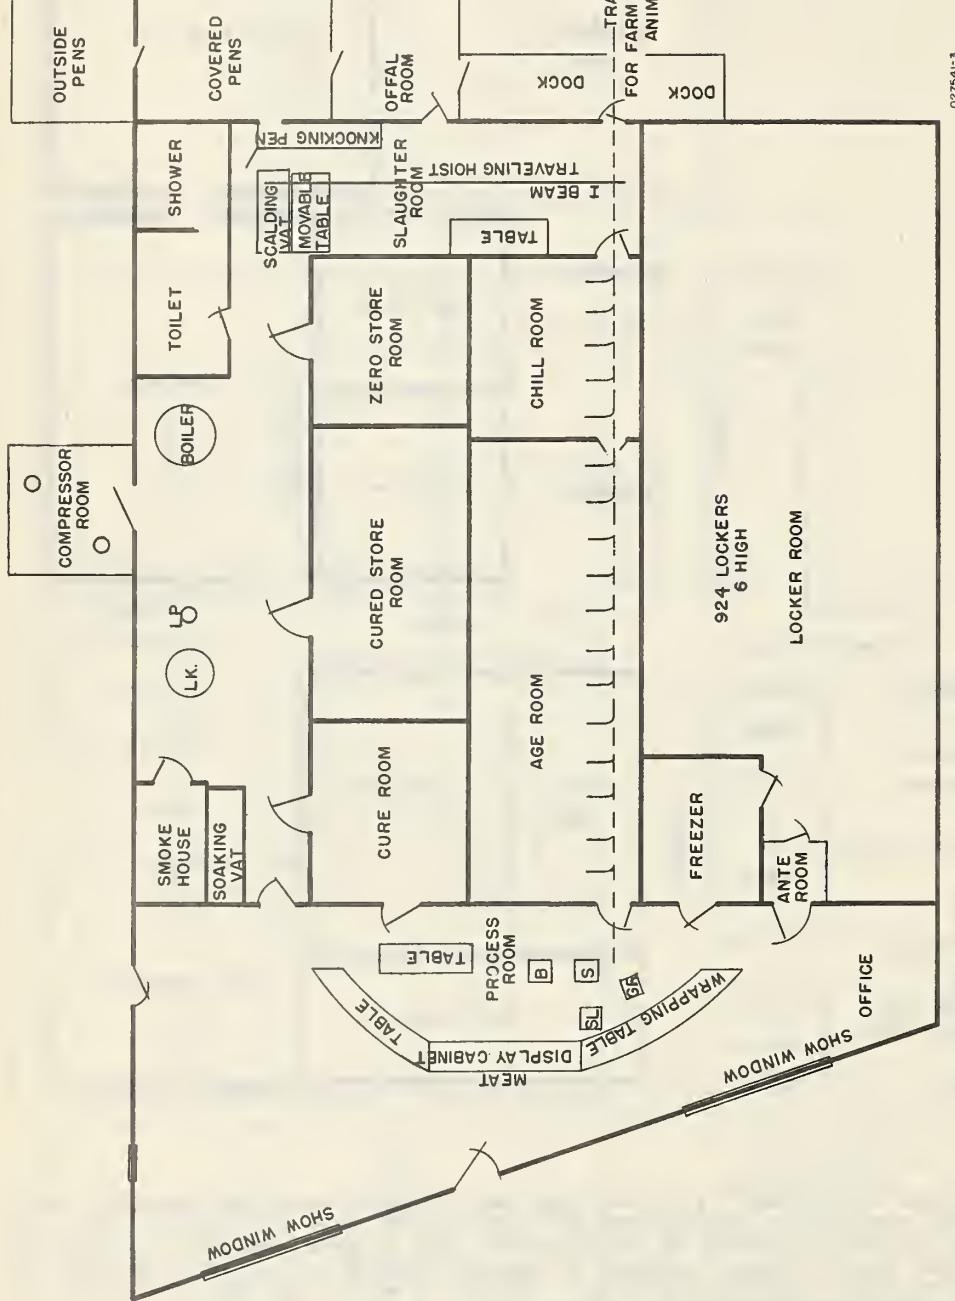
A farmers' locker and slaughter plant located in a medium size Southwestern city. The slaughter room is a small, rectangular room using mostly hand equipment with a traveling hoist mounted on an I-beam extending the length of the room. It slaughters for 924 lockers, its own retail meat market, and several outlets in the city. Its outstanding feature is a retail market selling meats and groceries. Both water and sewage disposal are supplied by the city. The plant was constructed of concrete block in 1944 at a cost of \$58,000.
